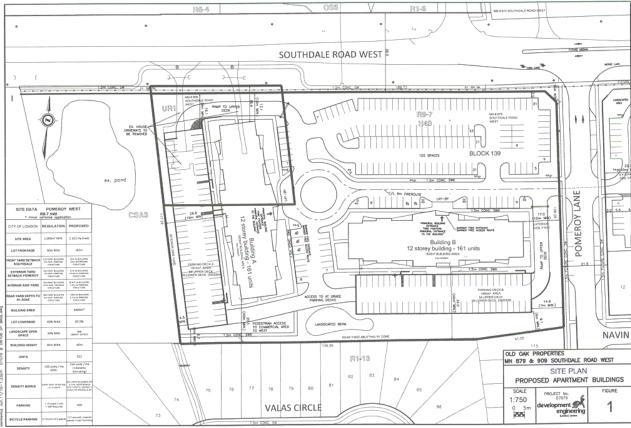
Conceptual site plan for a previously proposed development at 909 Southdale Road West and 3045 Pomeroy Lane. The requested Zoning By-law amendment sought to change the zoning of 909 Southdale Road West (outlined in black) to the same zoning as 3045 Pomeroy Lane.
